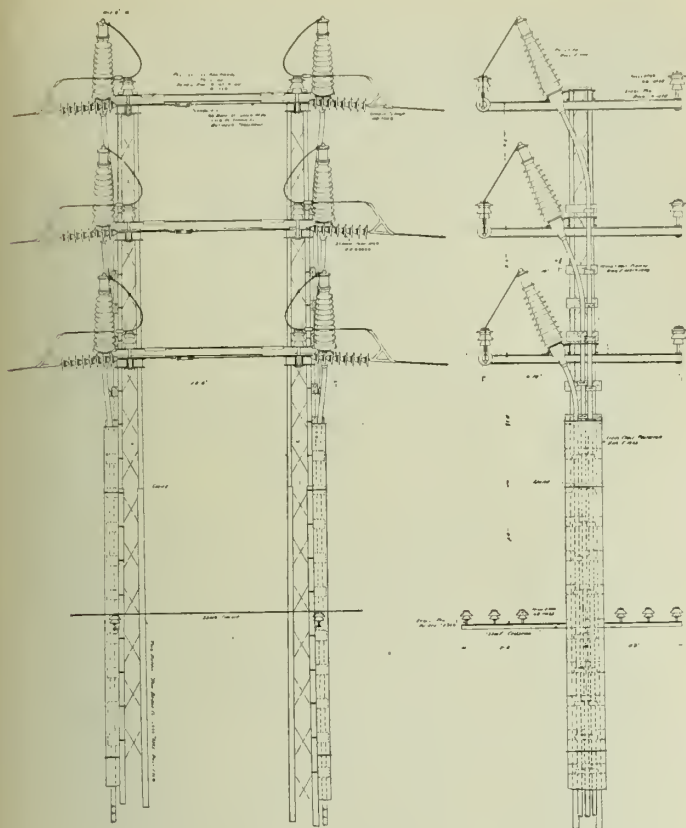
66-kv. Cable Heads Connecting with Overhead System.
